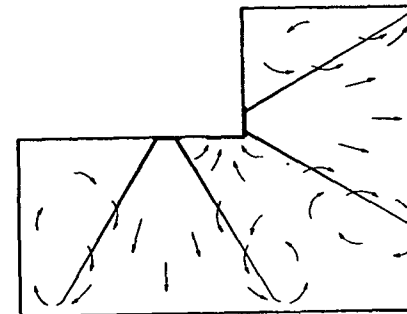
PLAN VIEW TYPICAL GENERAL OFFICE
